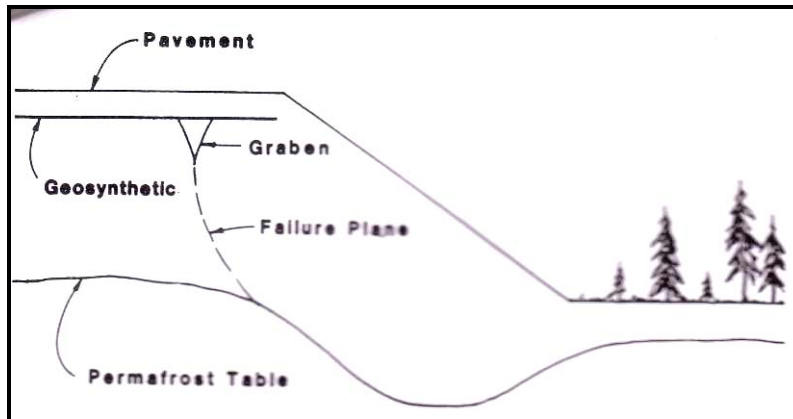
Geotextile bridging a graben (Rooney and Johnson, 1988)
